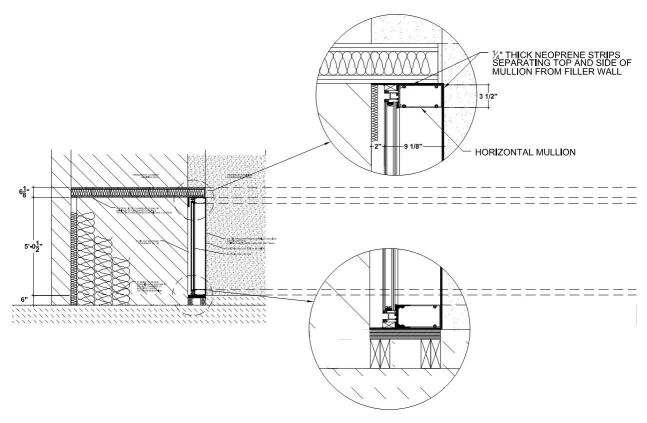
CHAMBER 3S AND 3R PLAN DRAWINGS AND ACOUSTIC DETAILS
